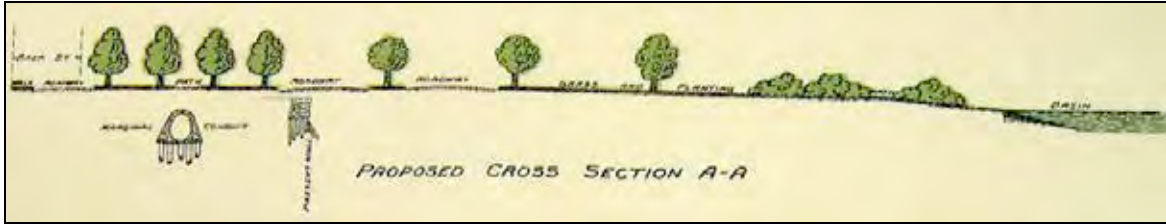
Cross section from Shurcliff's 1929 plan showing location of Back Street, Marginal Conduit and 1910 seawall in relation to the proposed parkland, as well as proposed plantings and the new water's edge. (DCR archives)
